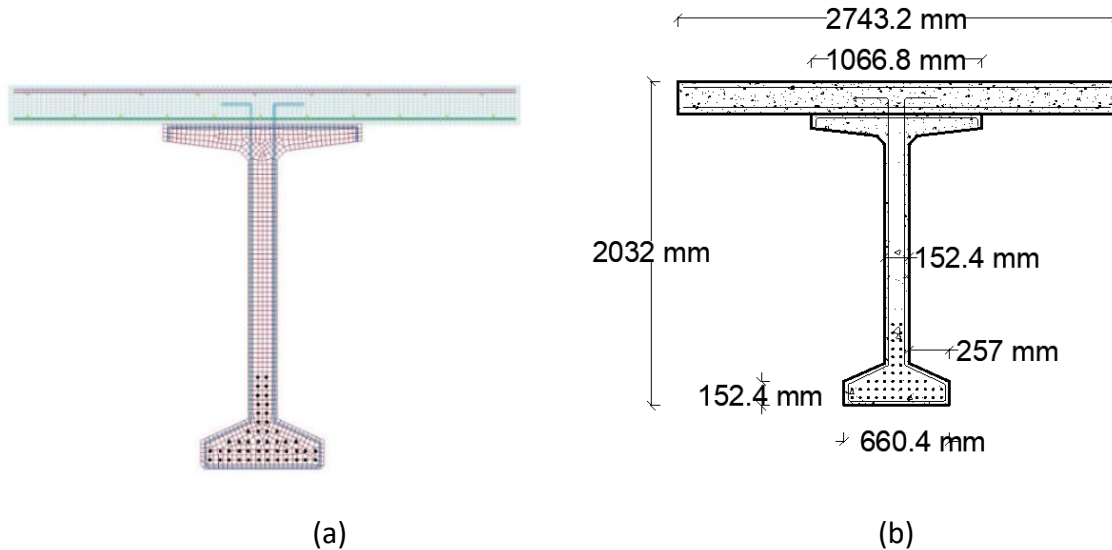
Bulb tee (BT -72) bridge girder (a) Dimensions , and (b) FE model
